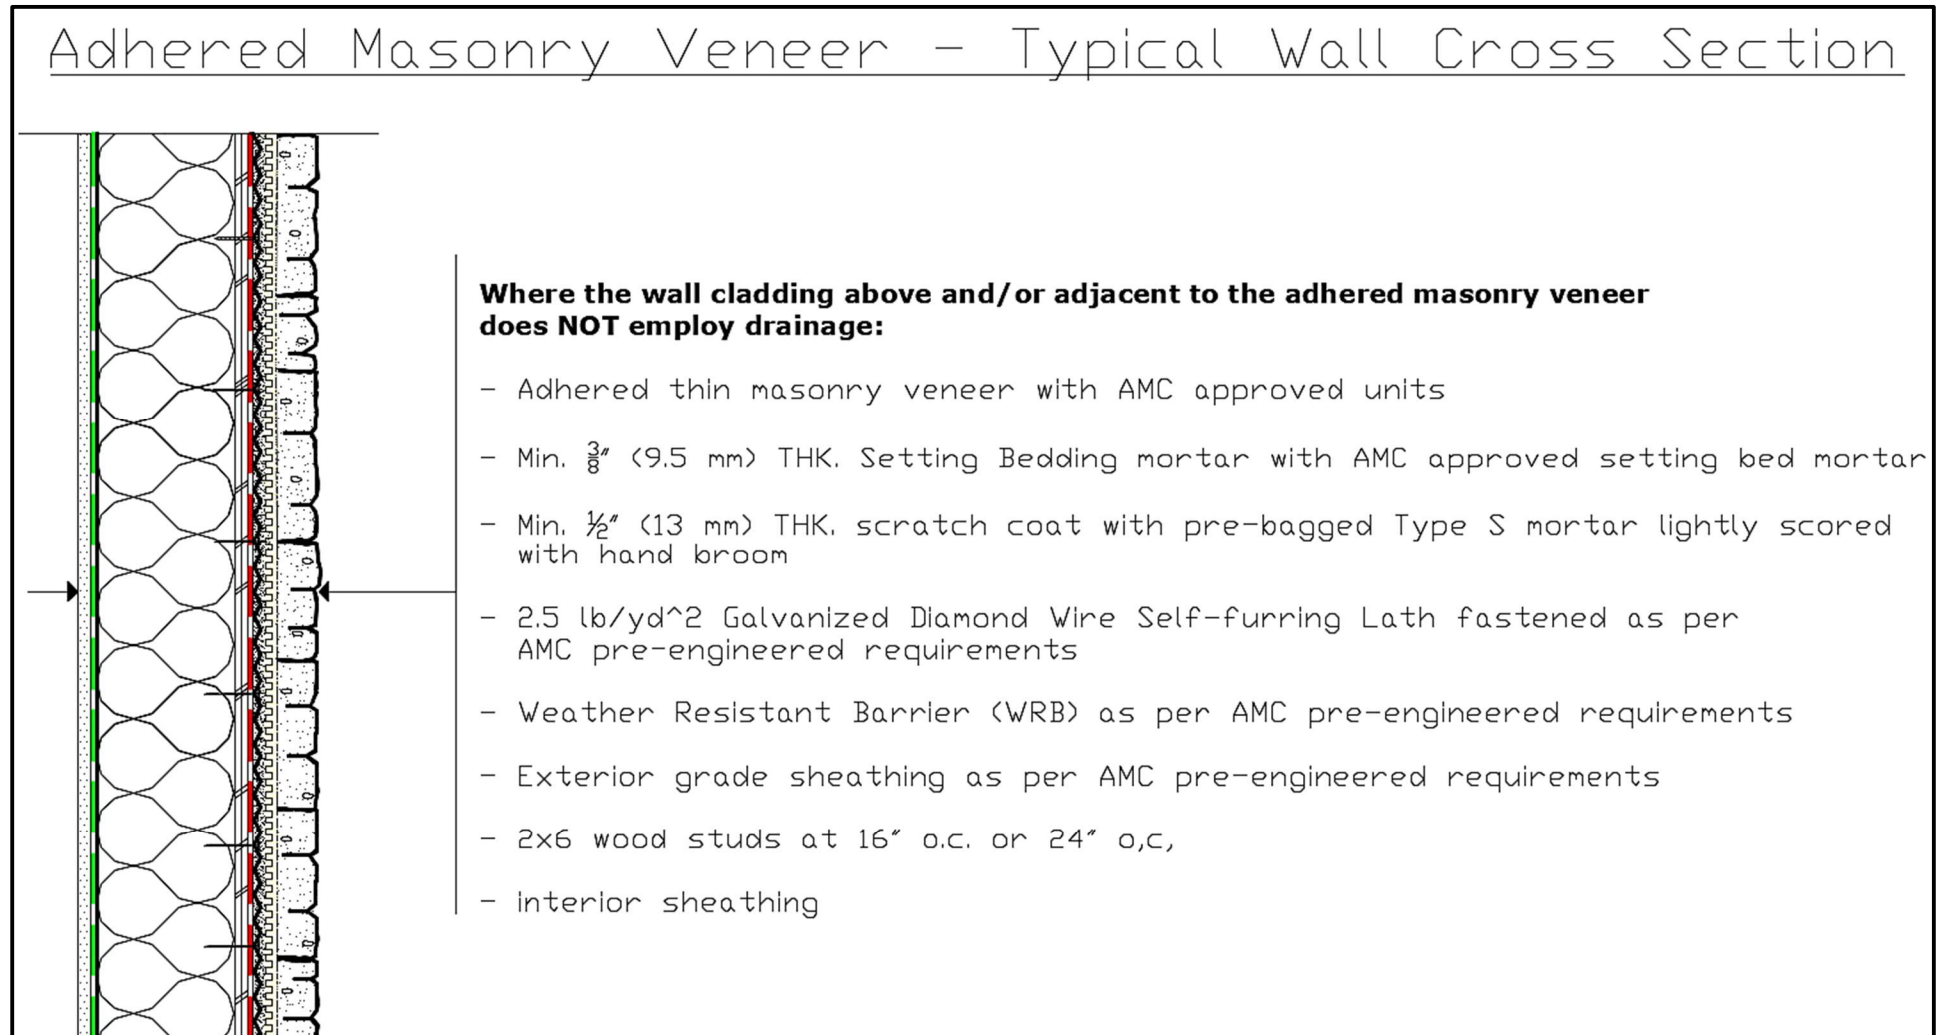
2D Detail of Components of Adhered Manufactured Stone Veneer without a Drainage Mat.
